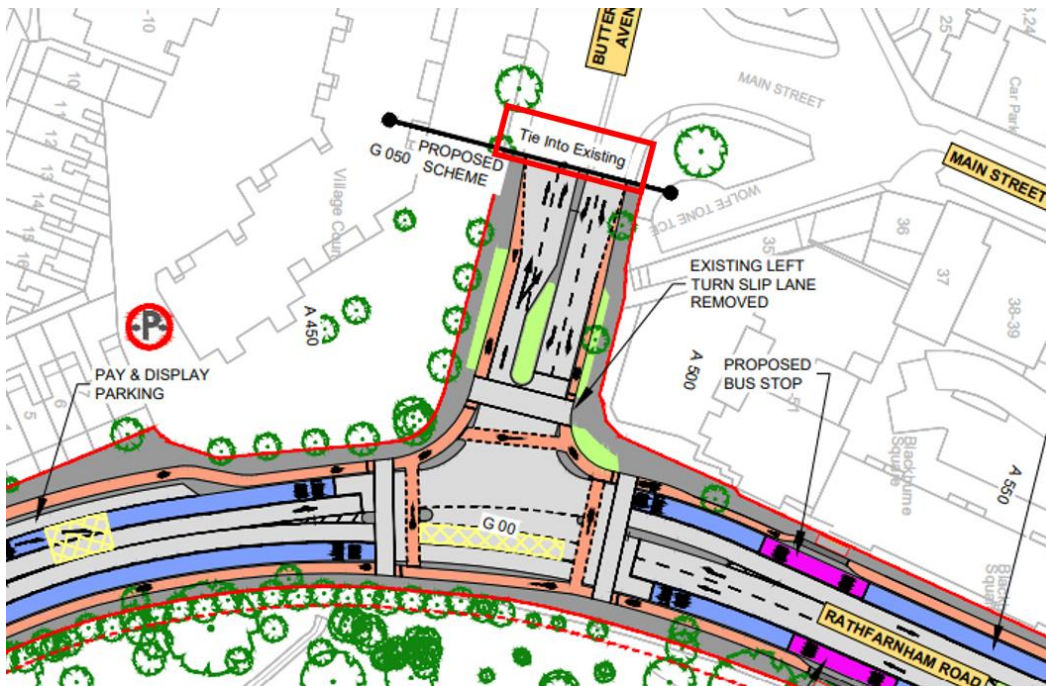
Extract from General Arrangement drawing at Butterfield Avenue
